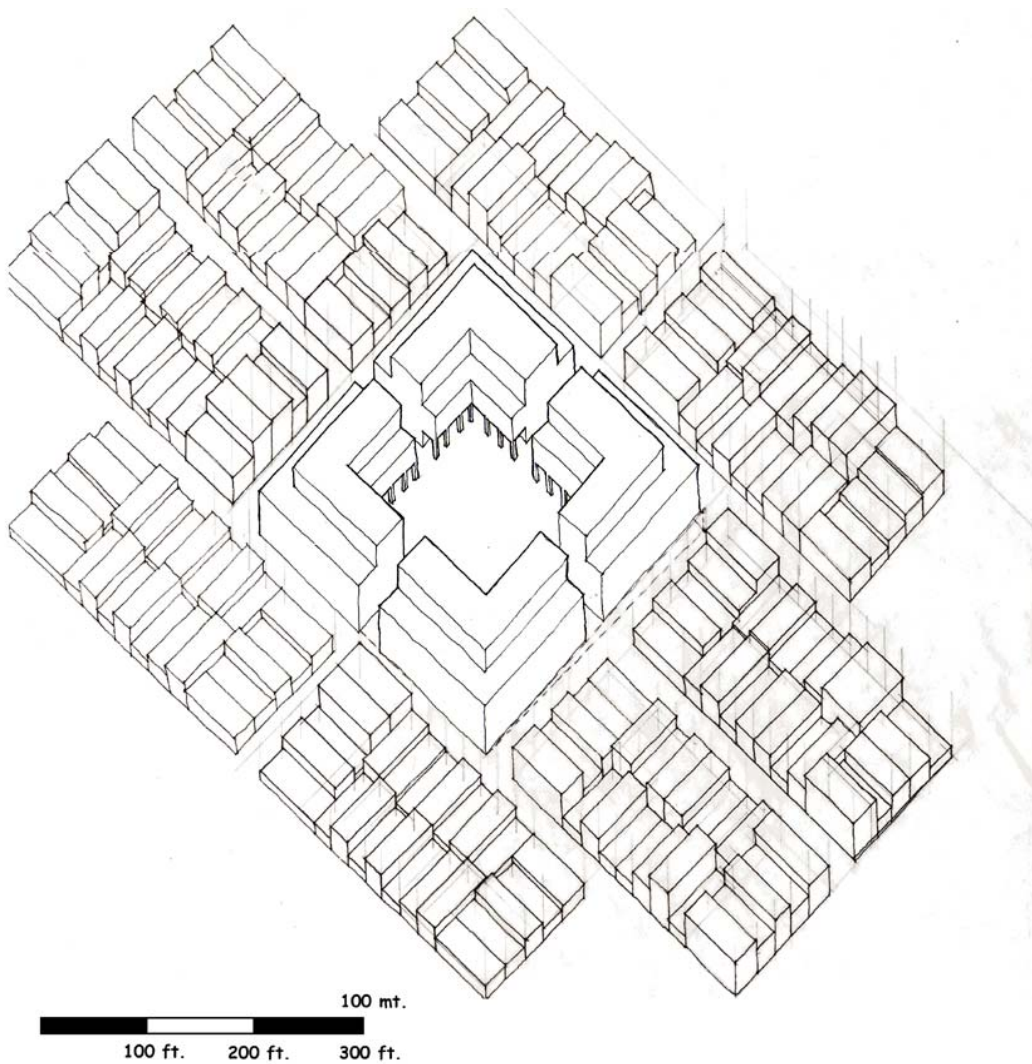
Courtyard Plaza Axonometric. Massing steps down towards existing neighborhood to create a smoother transition between the 4 story core and the 2-3 story surrounding structures.
